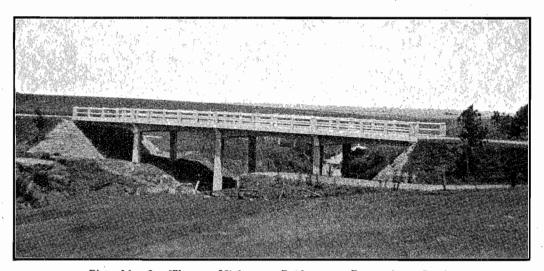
Western Highway. Bridge over Burrumbeet Creek.
